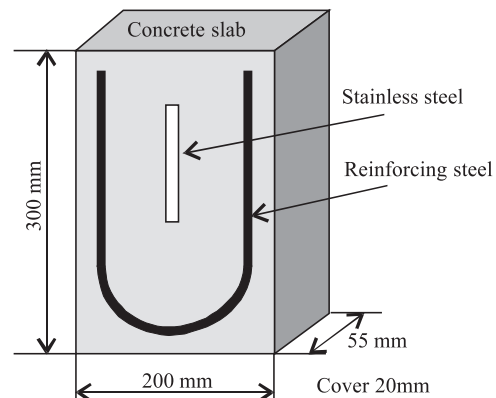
Sketch of concrete slab with embedded U-shaped rebar.
